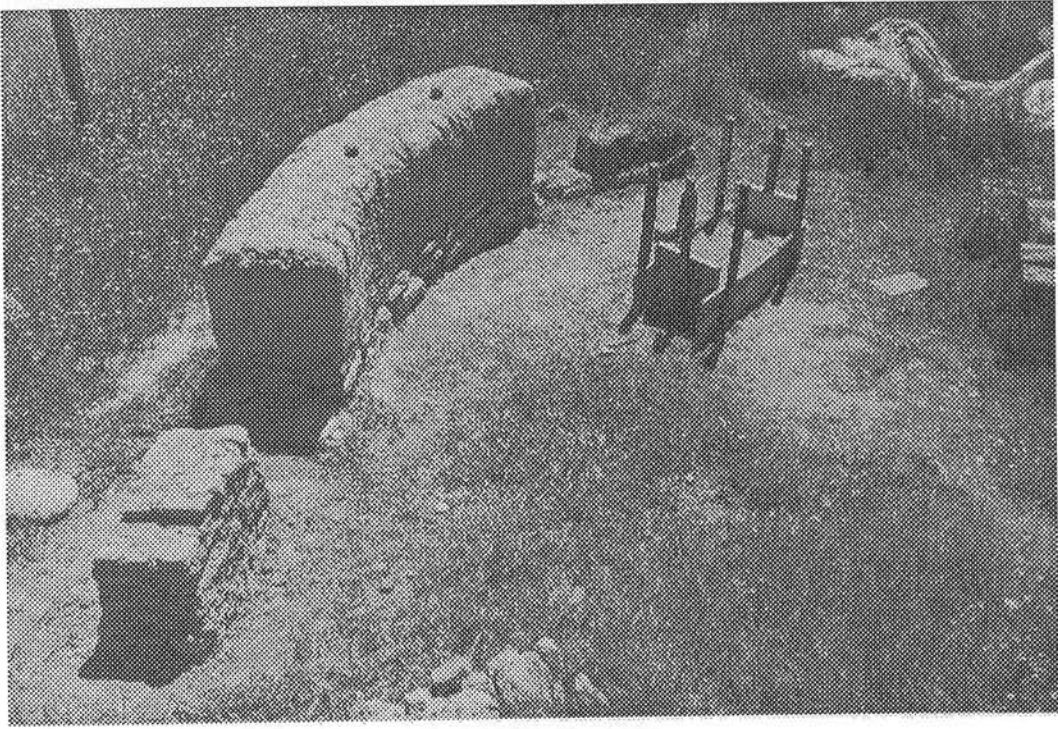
LEV, view of the experiments in wall construction, E4, E17, E18 and E20.
